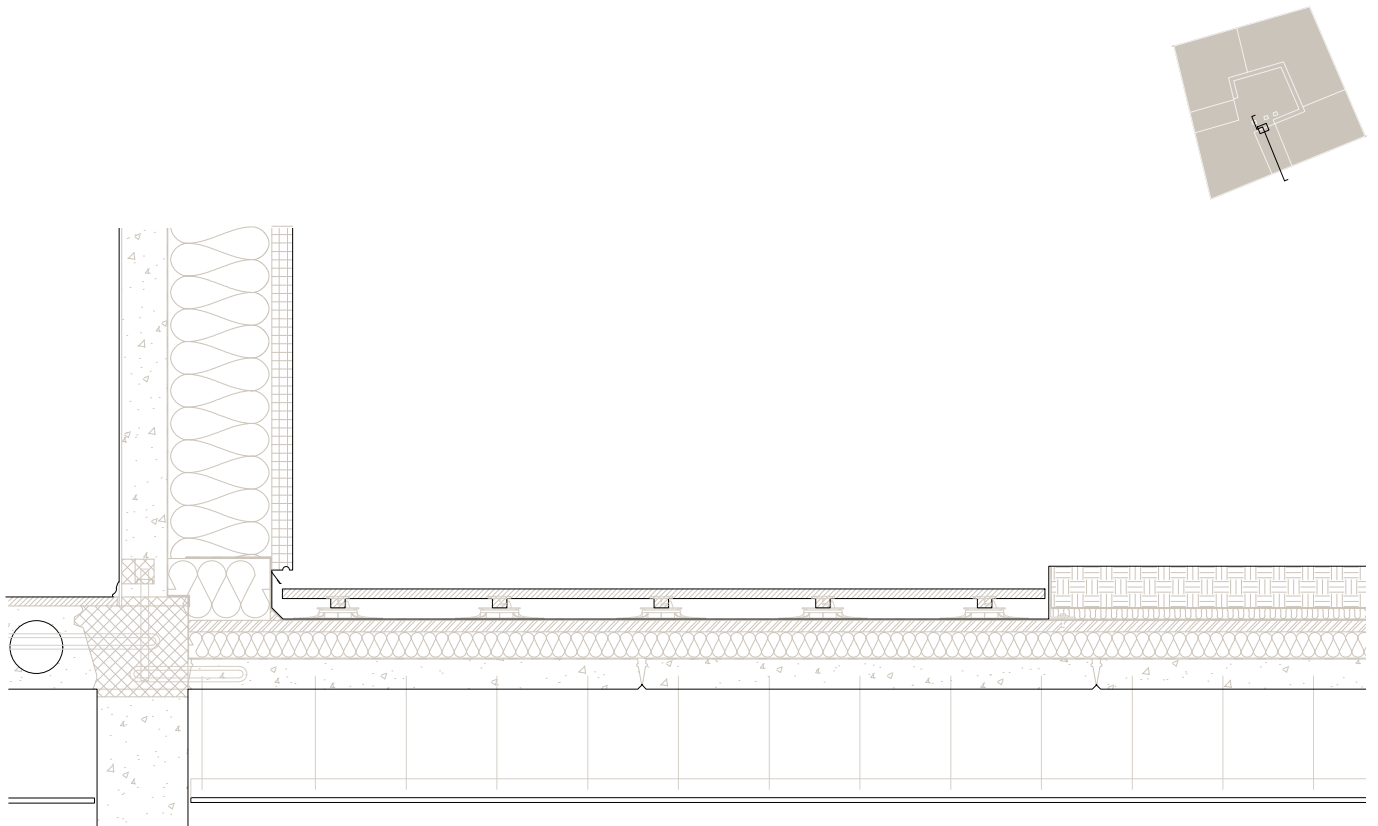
Detail 2: Terrace wooden flooring connection with green roof, facade wall and wooden railing 1:20
